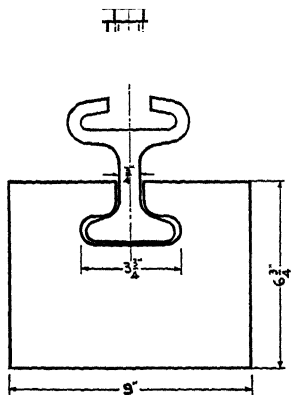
Furnace arch is constructed of bricks with a T-slot, which, by means of steel clips, are fastened to I-beams above.
